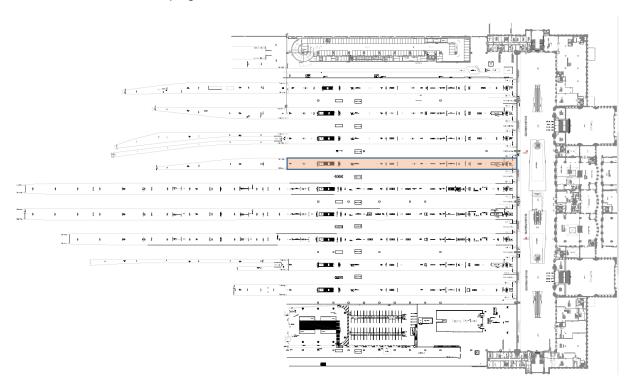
Floor plan of Leipzig station with marking of the hall area of track 17
